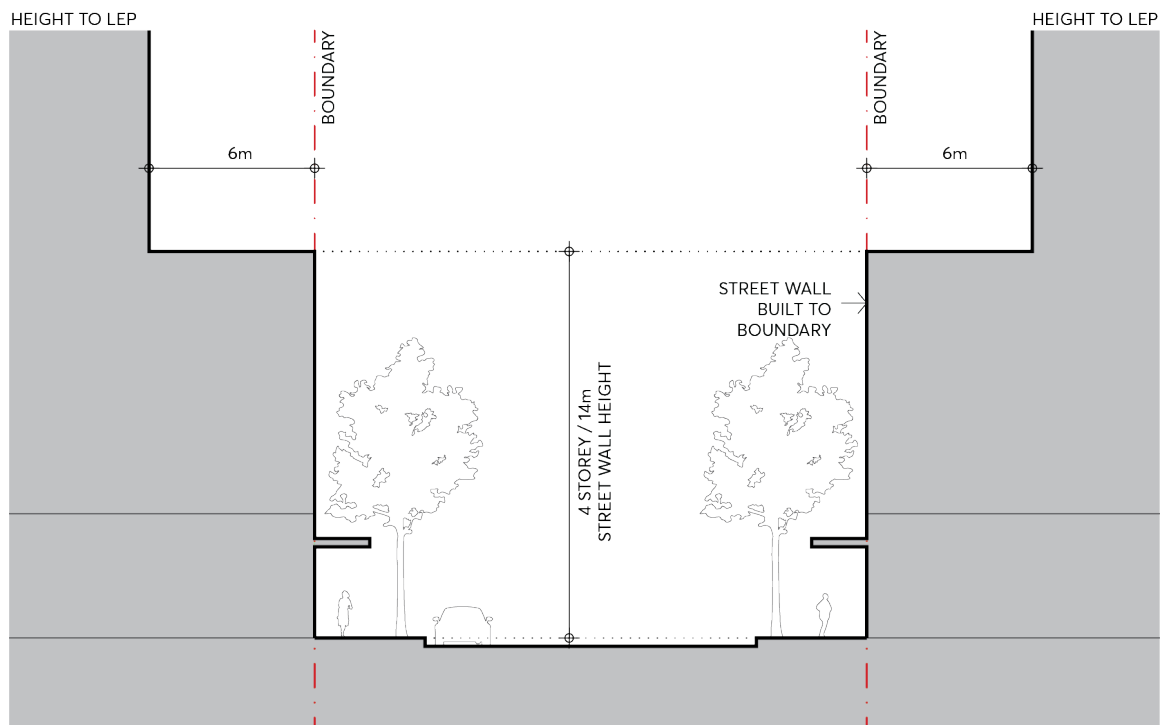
Park Edge Highly Sensitive Area Street Wall Height and Setbacks
